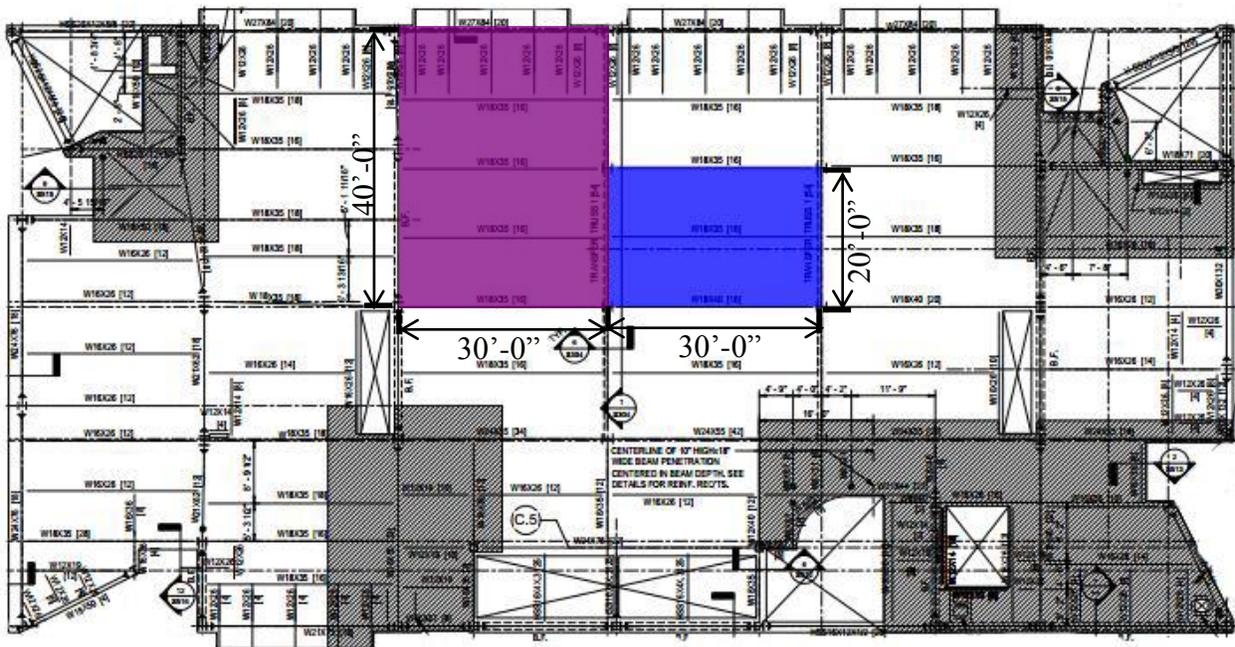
Typical Floor Plan with Typical Bay Sizes Emphasized
